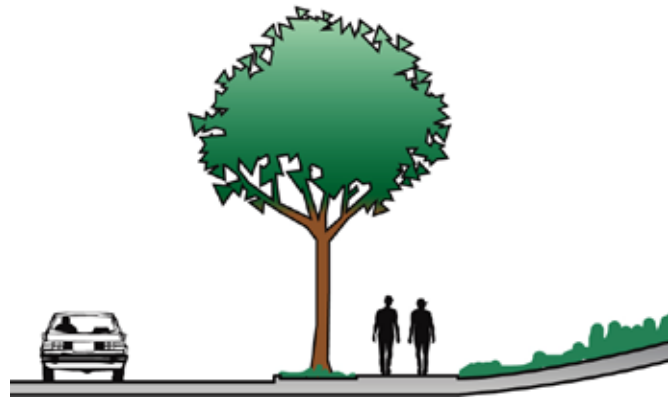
Typical streetscape planting on Cockleburrr Road leading to MCTSSA (31B) Area.
